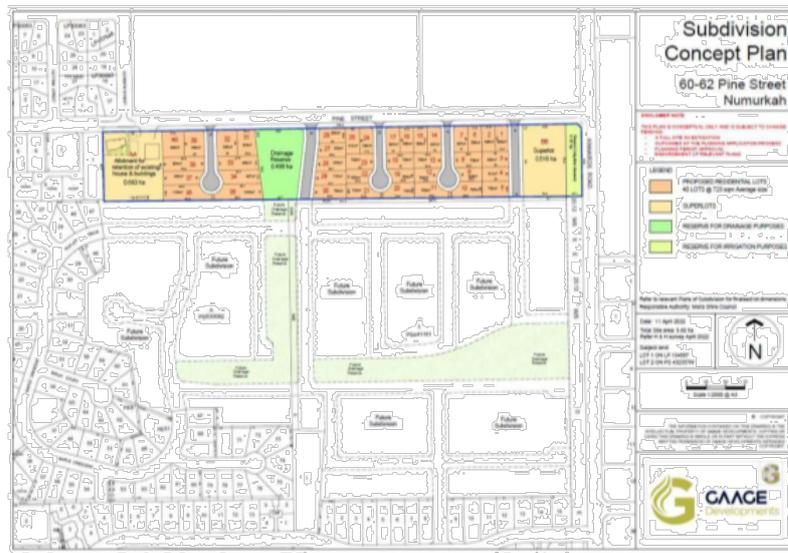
Permit 1 Concept Subdivision Plan (Gaage Developments, 2022)
